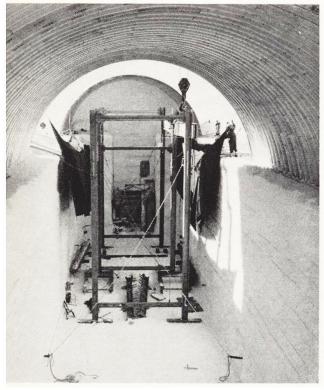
Reactor Cut-and-Cover Tunnel Bridged by Metallic Arches [7]
